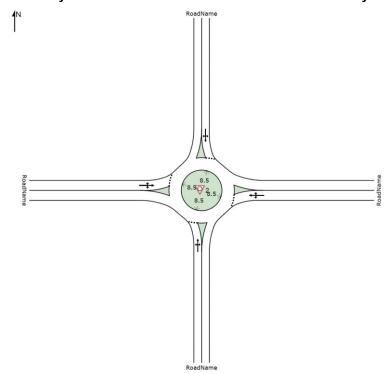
Roundabout Intersection of Brisbane Street with Sydney Street
